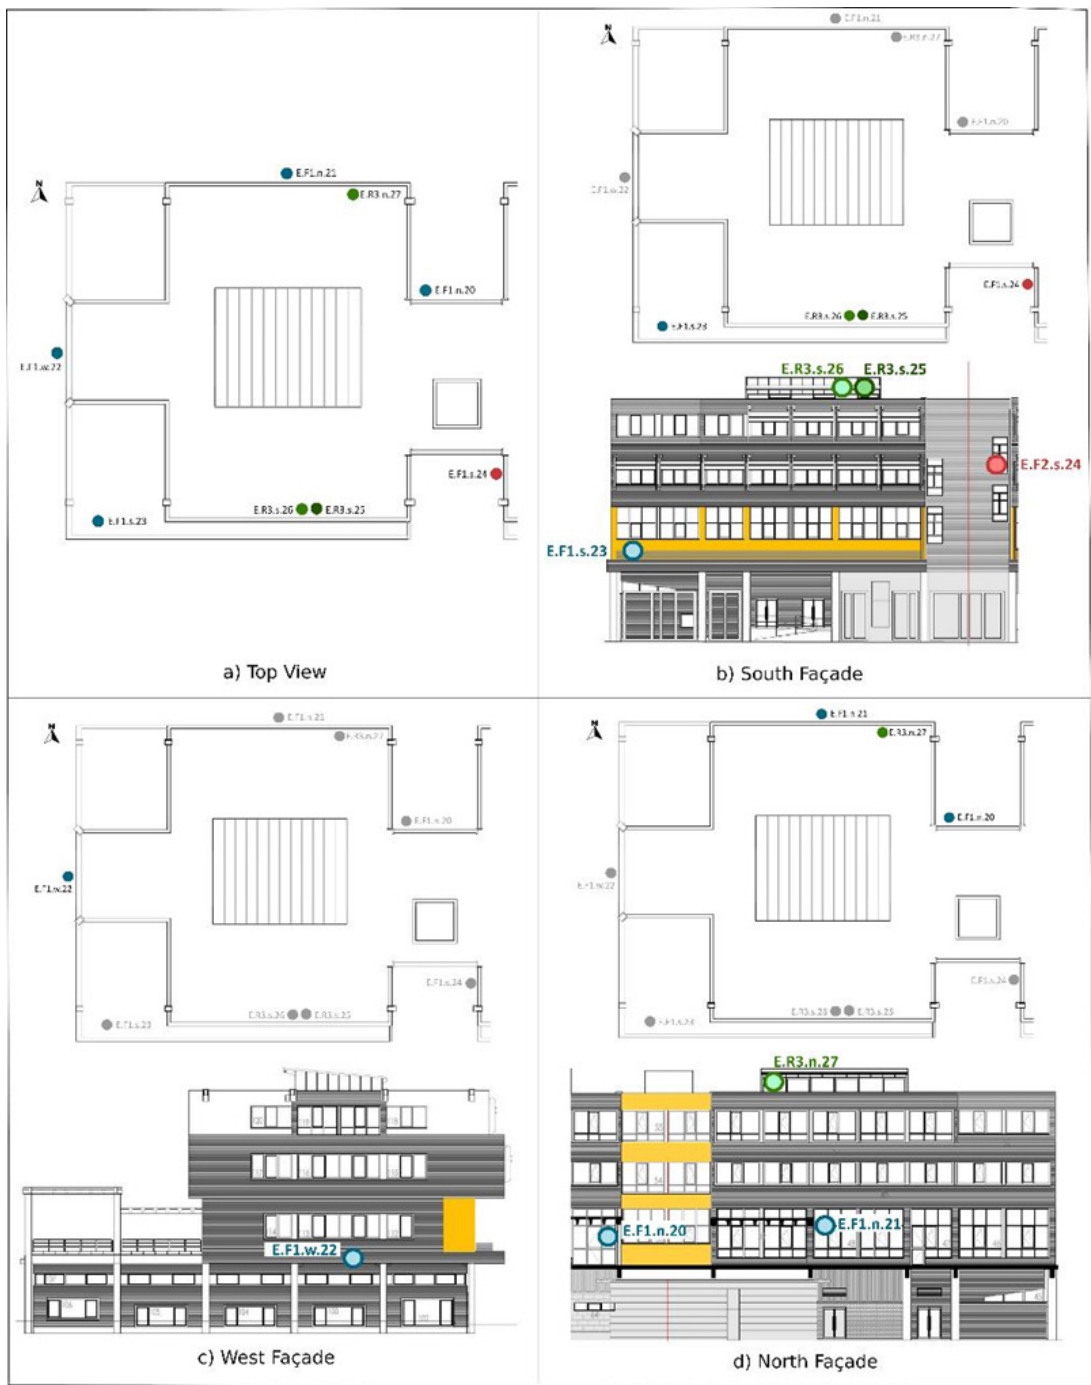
Sensor Layout of Exterior (E) Test: a) Top View, b) South Façade, c) West Façade and d) North Façade.
